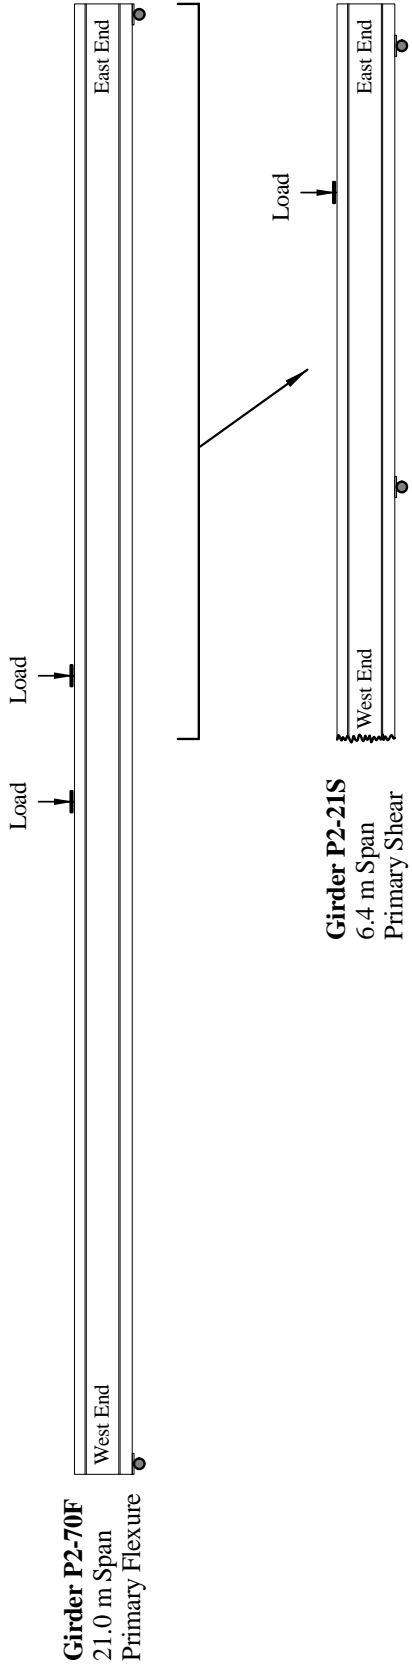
Illustration. Origin of Girder P2-70F and P2-21S test specimens.
